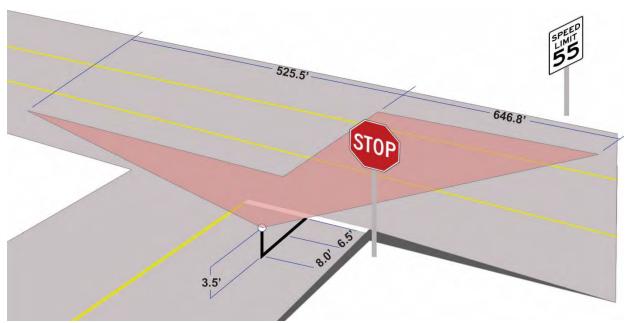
AASHTO minimum recommended intersection sight distance dimensions at the proposed landfill expansion access.
